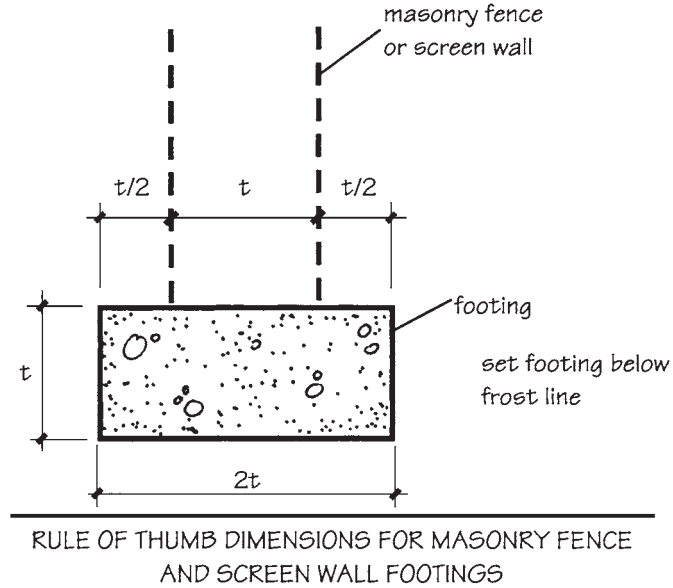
Footings for masonry fences and screen walls. (From Beall, *Masonry and Concrete for Residential Construction*, McGraw-Hill Complete Construction Series, McGraw-Hill, New York, 2001.)
